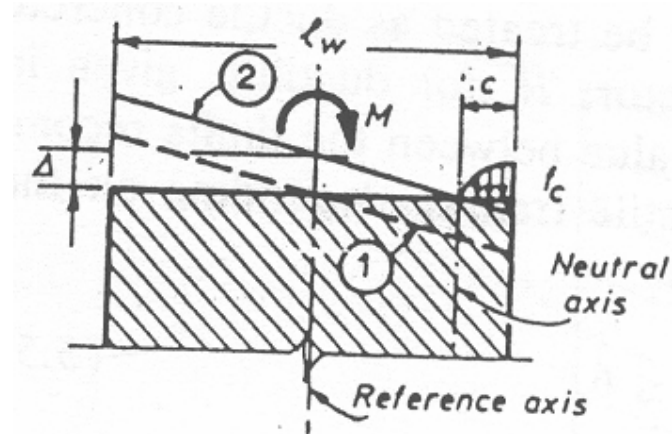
Effects of curvature on uncracked and cracked wall sections
